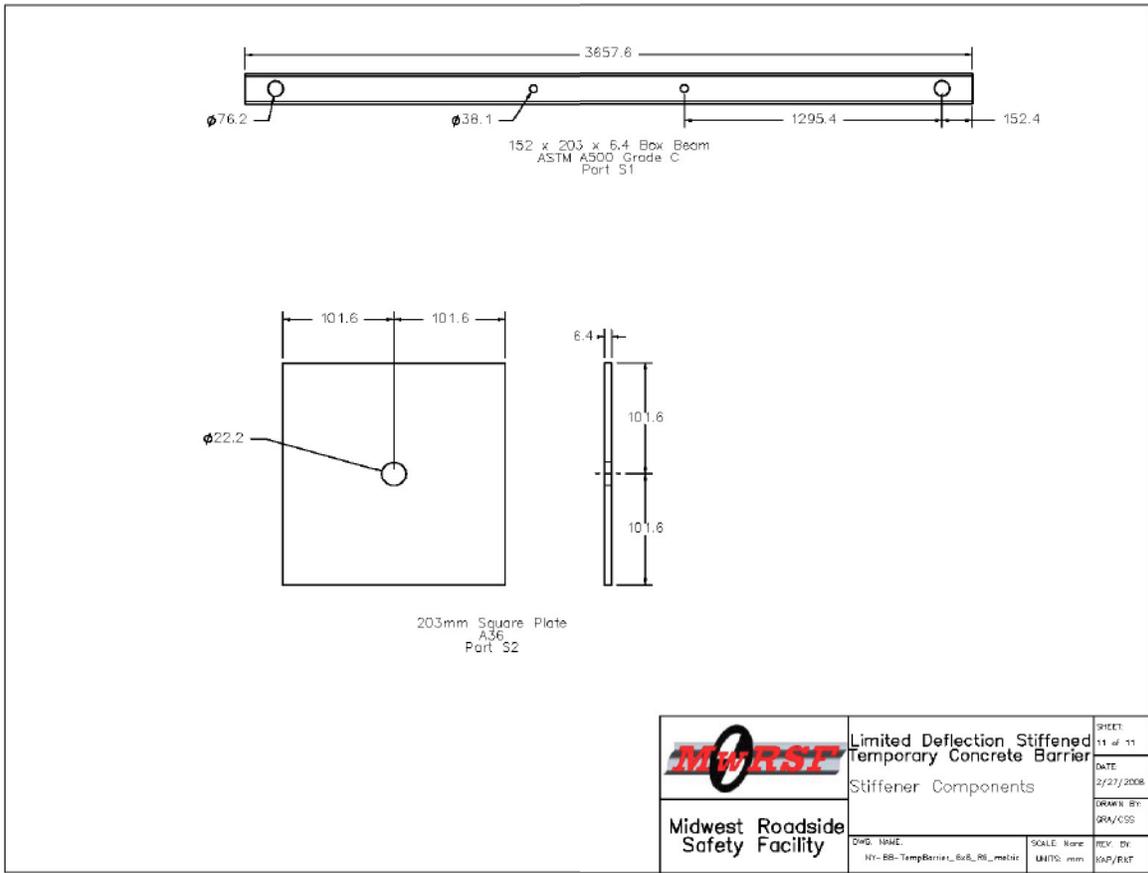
Box Beam Stiffener Details, Test NYTCB-3
